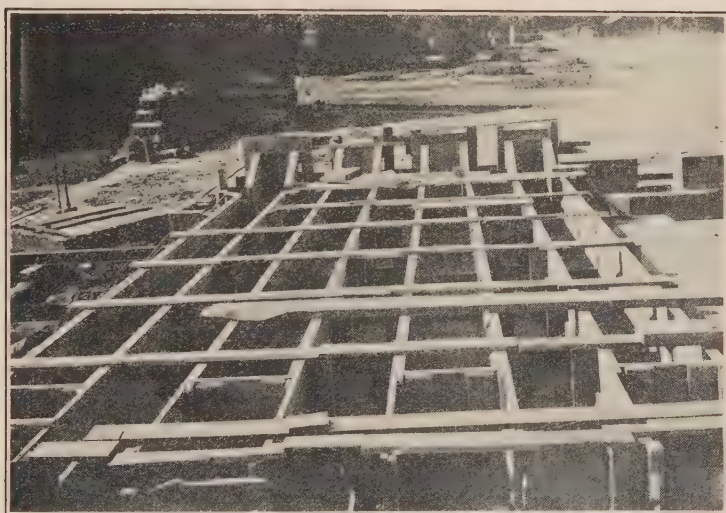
FORMS READY FOR CONCRETING, CAR BARN, HARRISBURG, PA.
